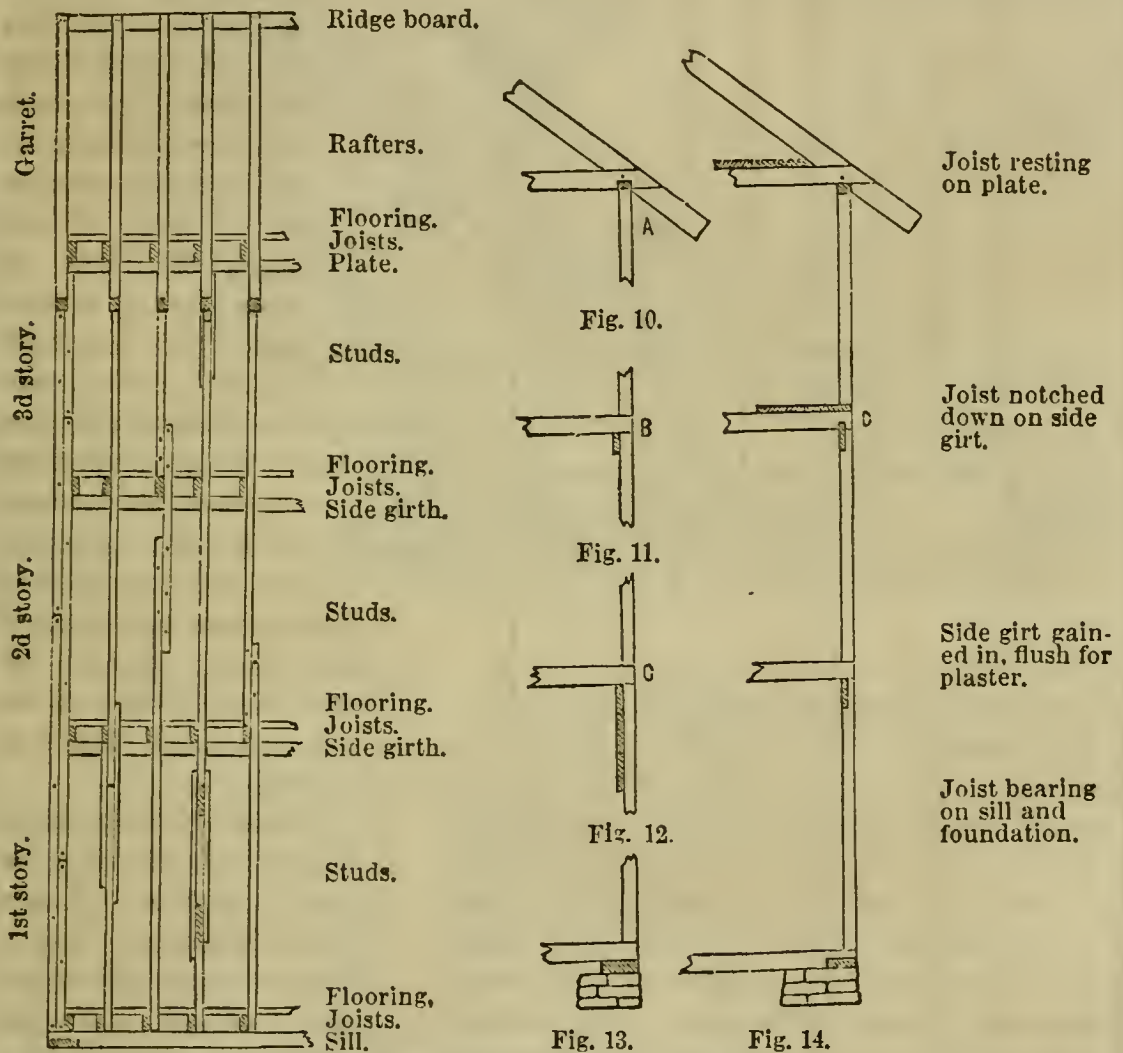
THREE STORY BUILDING. BALLOON FRAMING. DETAILS.
